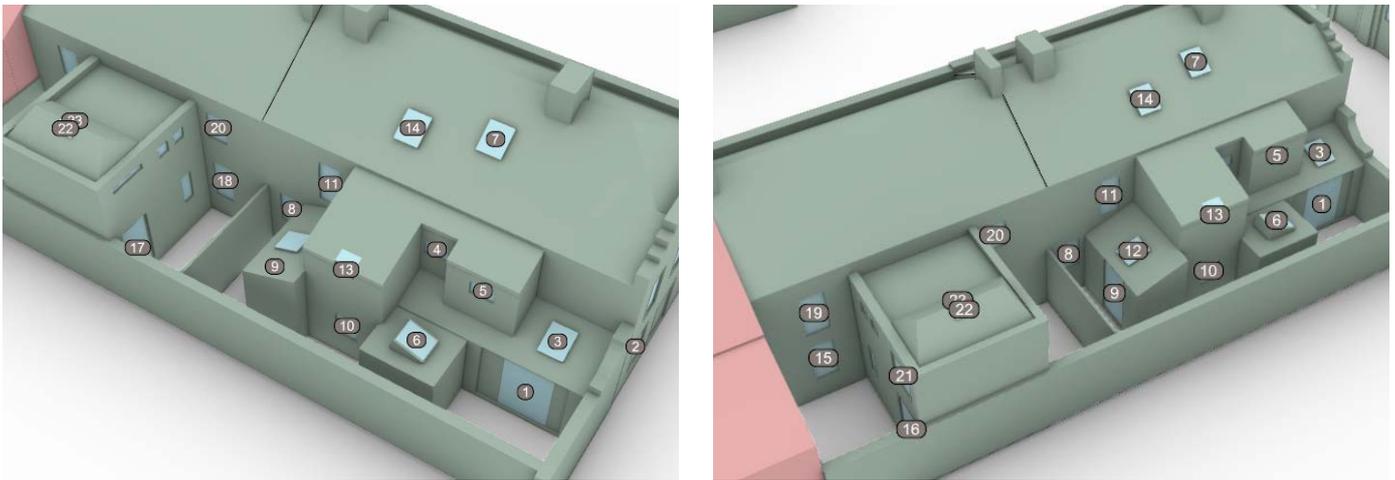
No.5 Sussex Street and No.11 - 12 Eblana Avenue - View of model locating VSC test points
